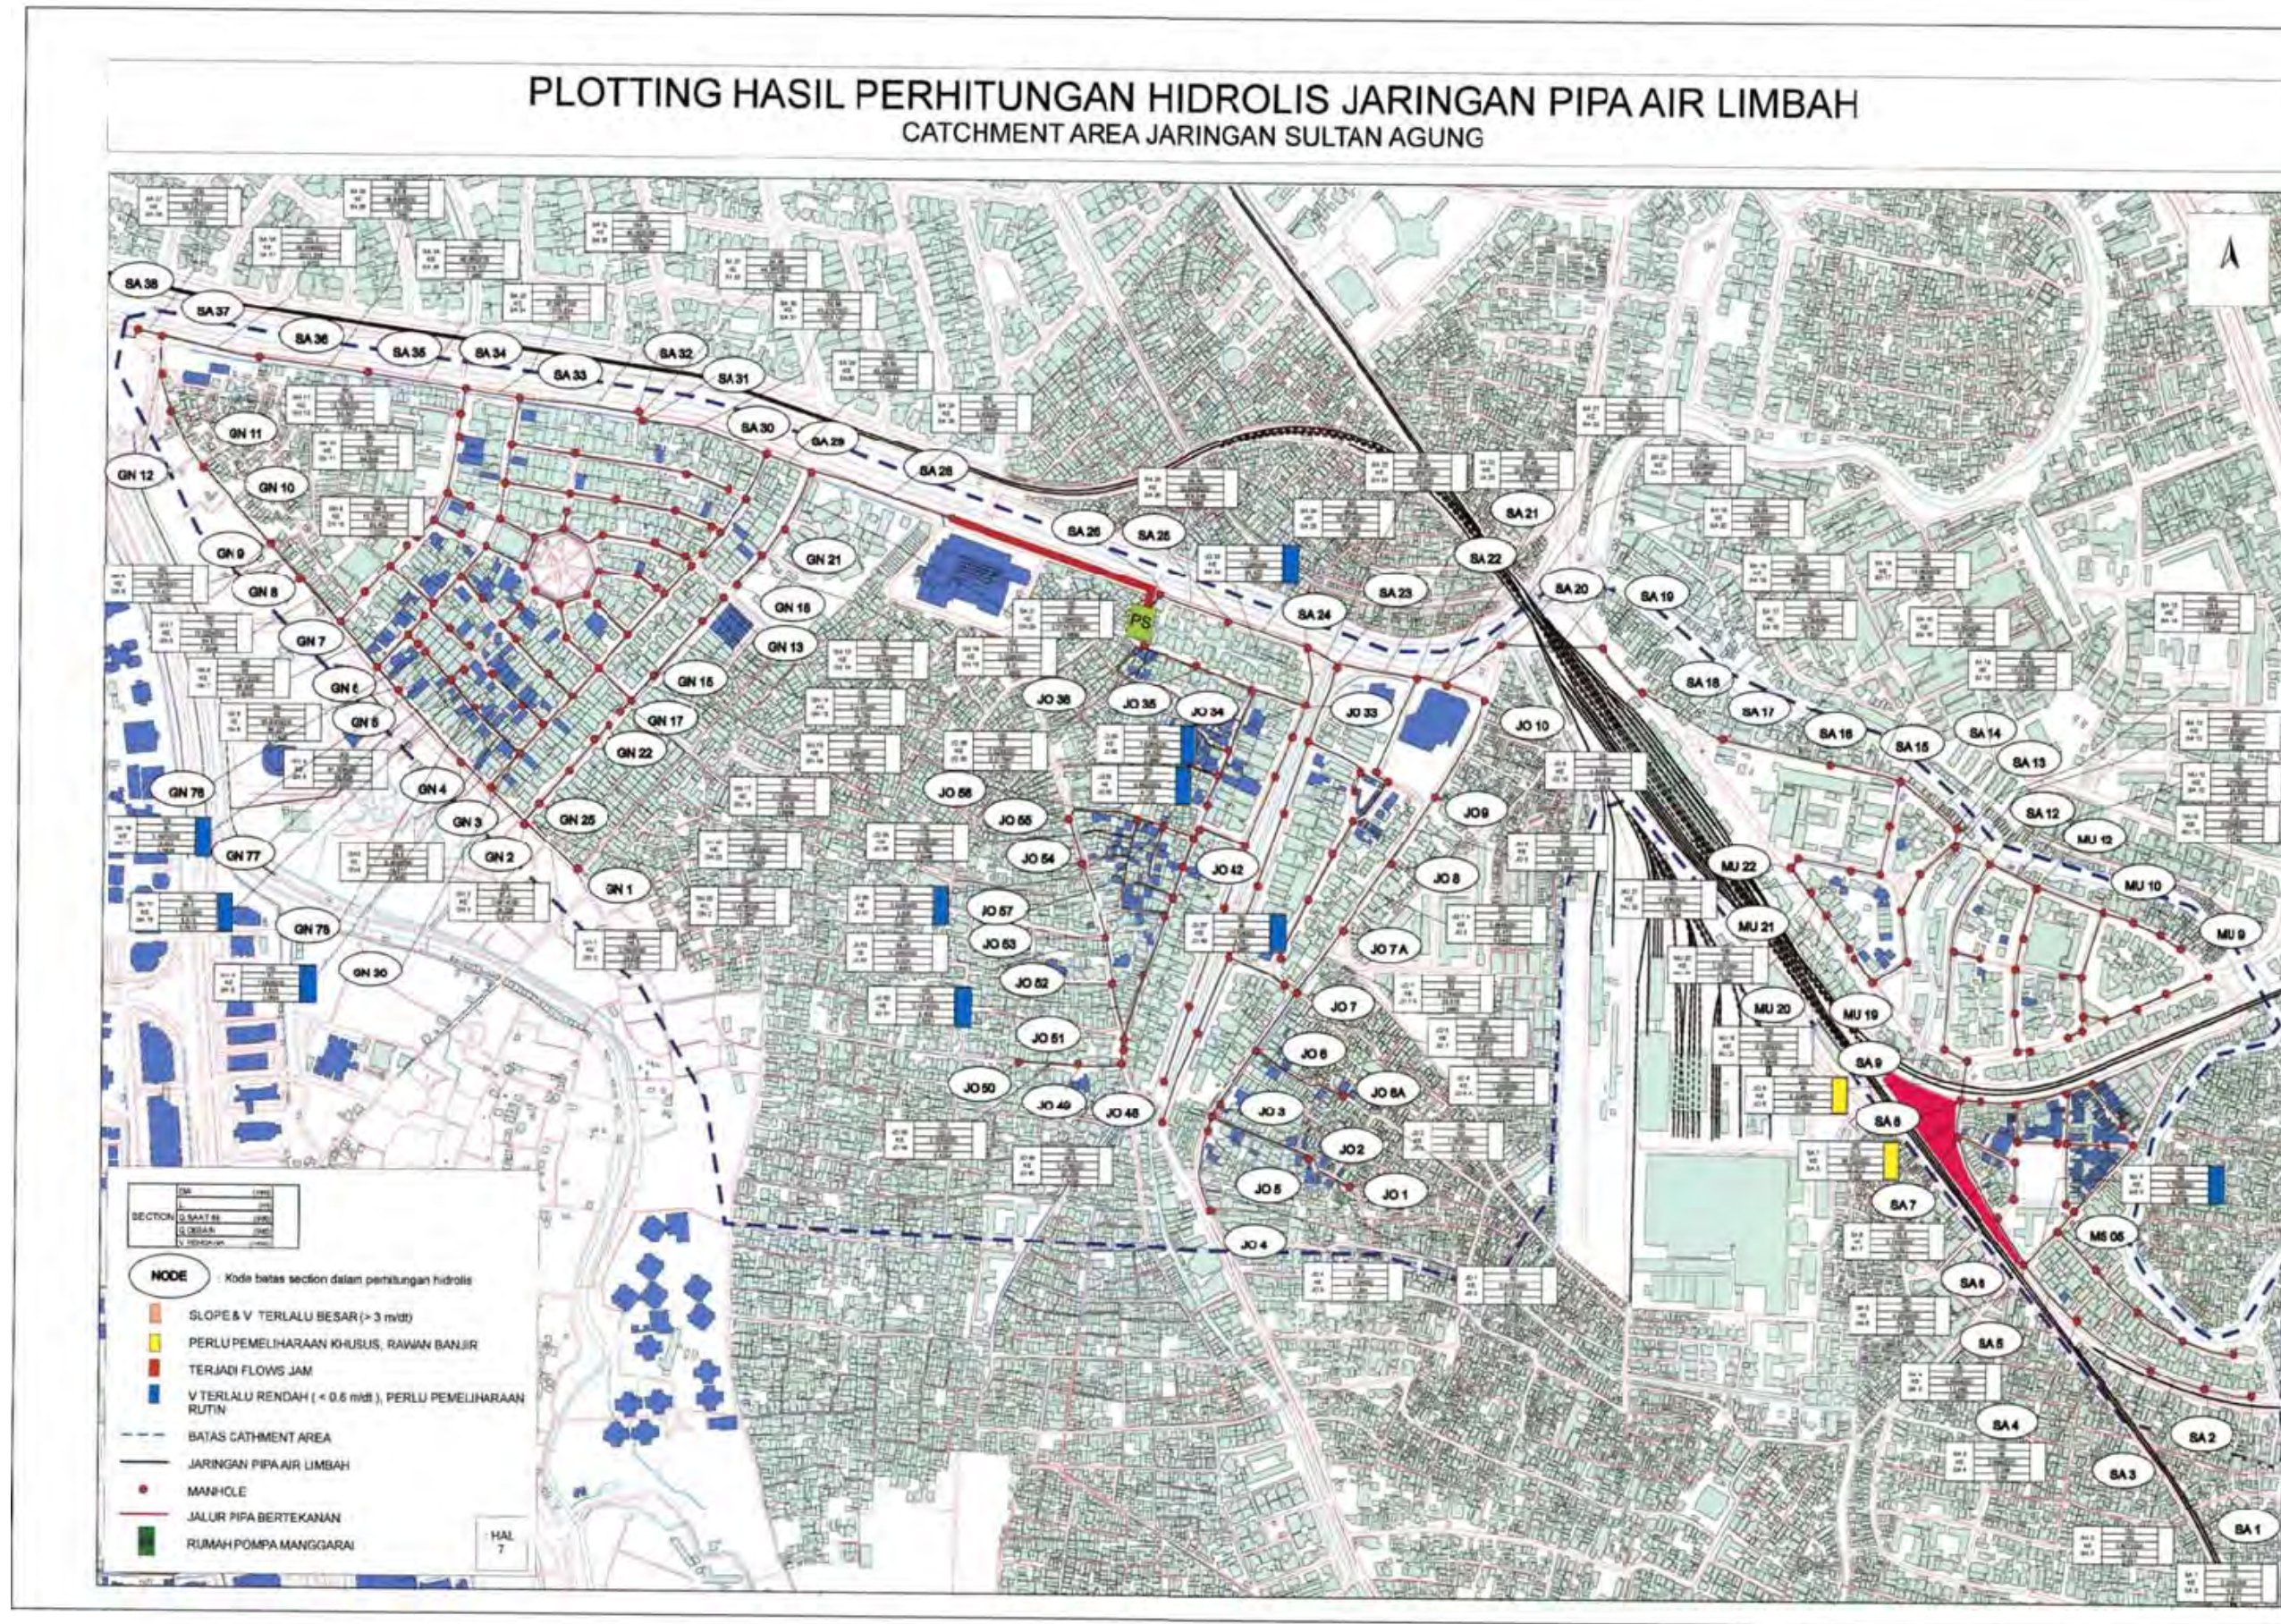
Layout of Sewer Pipeline (6/6)
